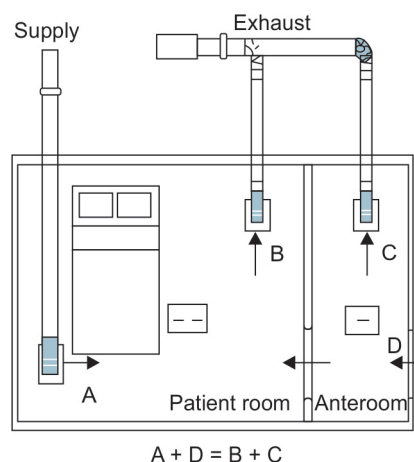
Negative pressure isolation room (adapted from HVAC design for healthcare facilities by CED engineering)<sup>12</sup>
